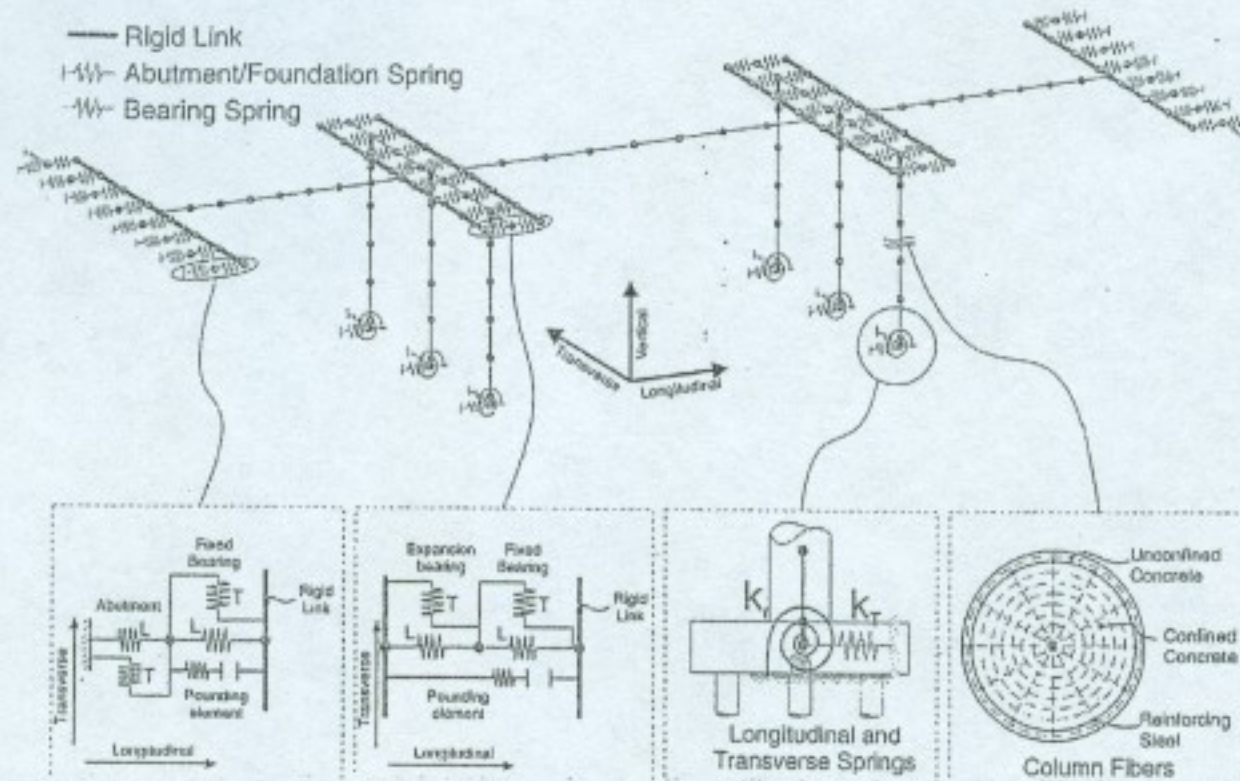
Nonlinear analytical model of multi-span simply supported steel girder bridge including nonlinear elements used for abutments, bearings and columns.
